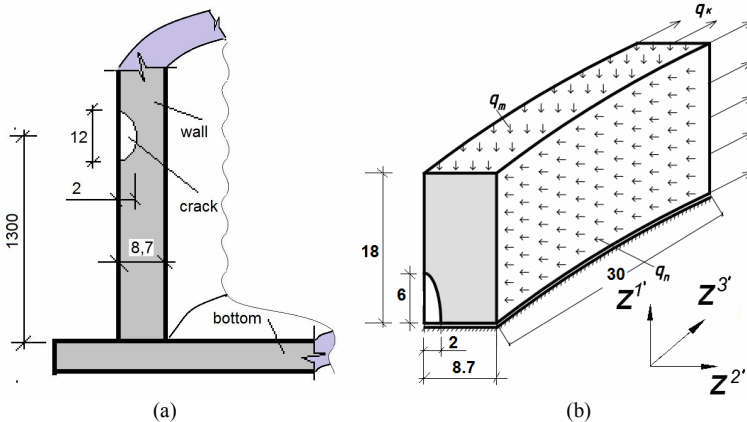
The location of the crack in the wall of the tank (a) and the calculation scheme of the wall fragment with a crack (b)
